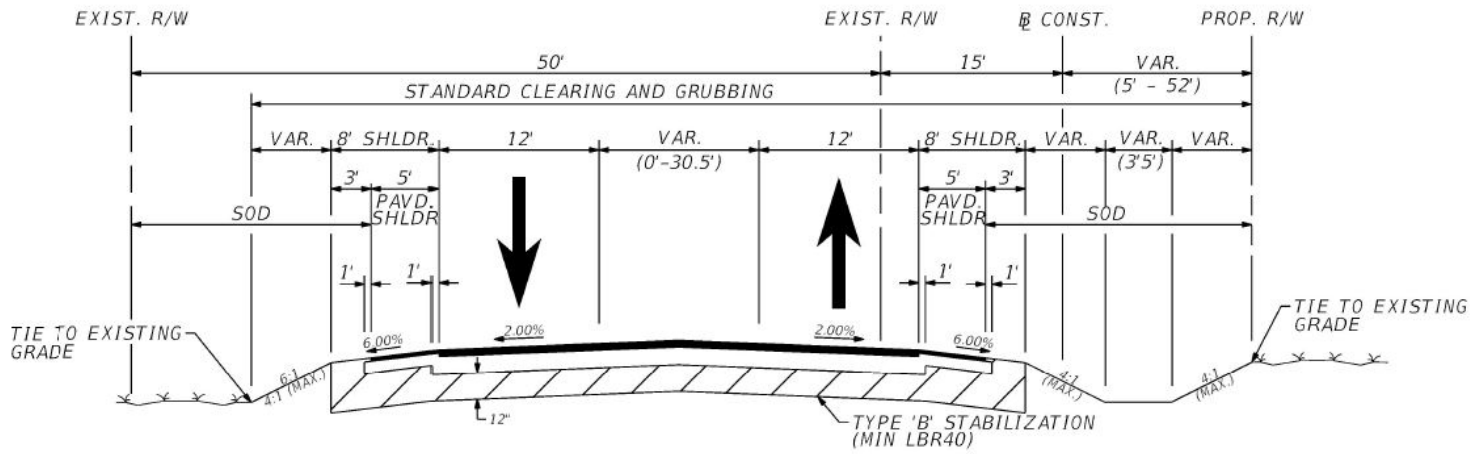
B – Proposed 58th Avenue Typical Section – Fully Developed Section South of 49th Street
